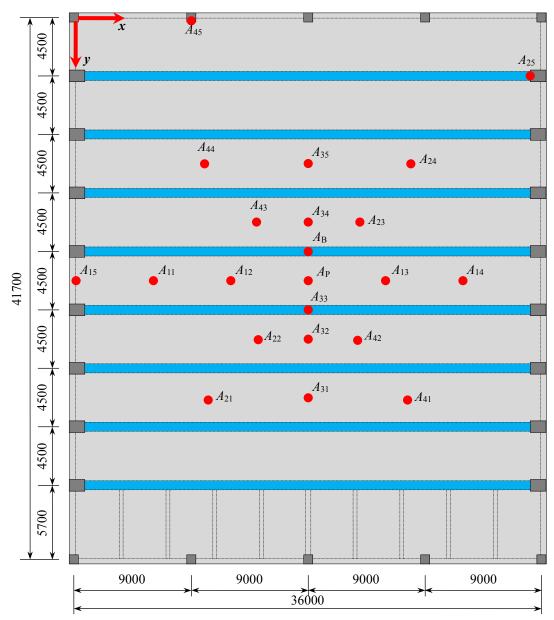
Outline of prestressed concrete floor #6 (all dimensions in mm)
